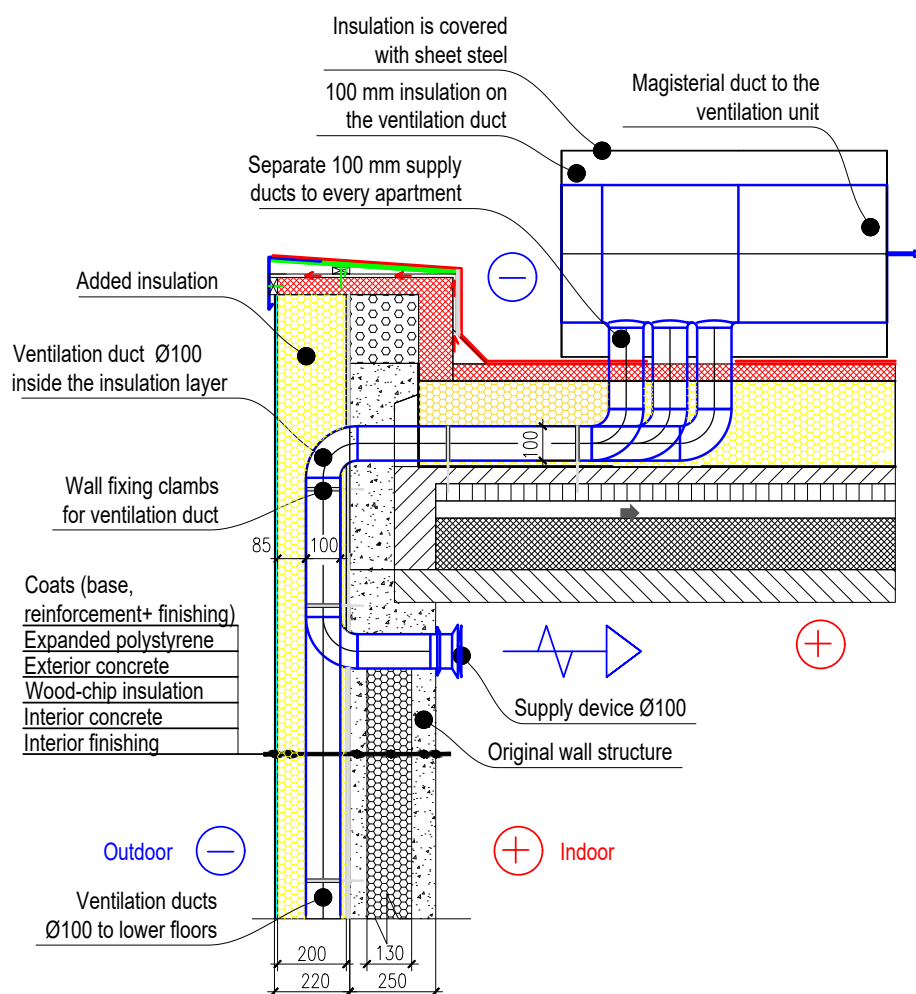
A section of CHR system with ventilation ducts inside the building façade.
